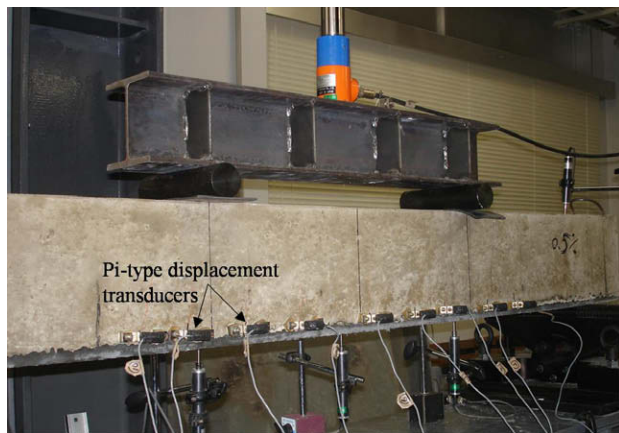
Second loading setup for repaired RC beams and cracks opening measurements.
